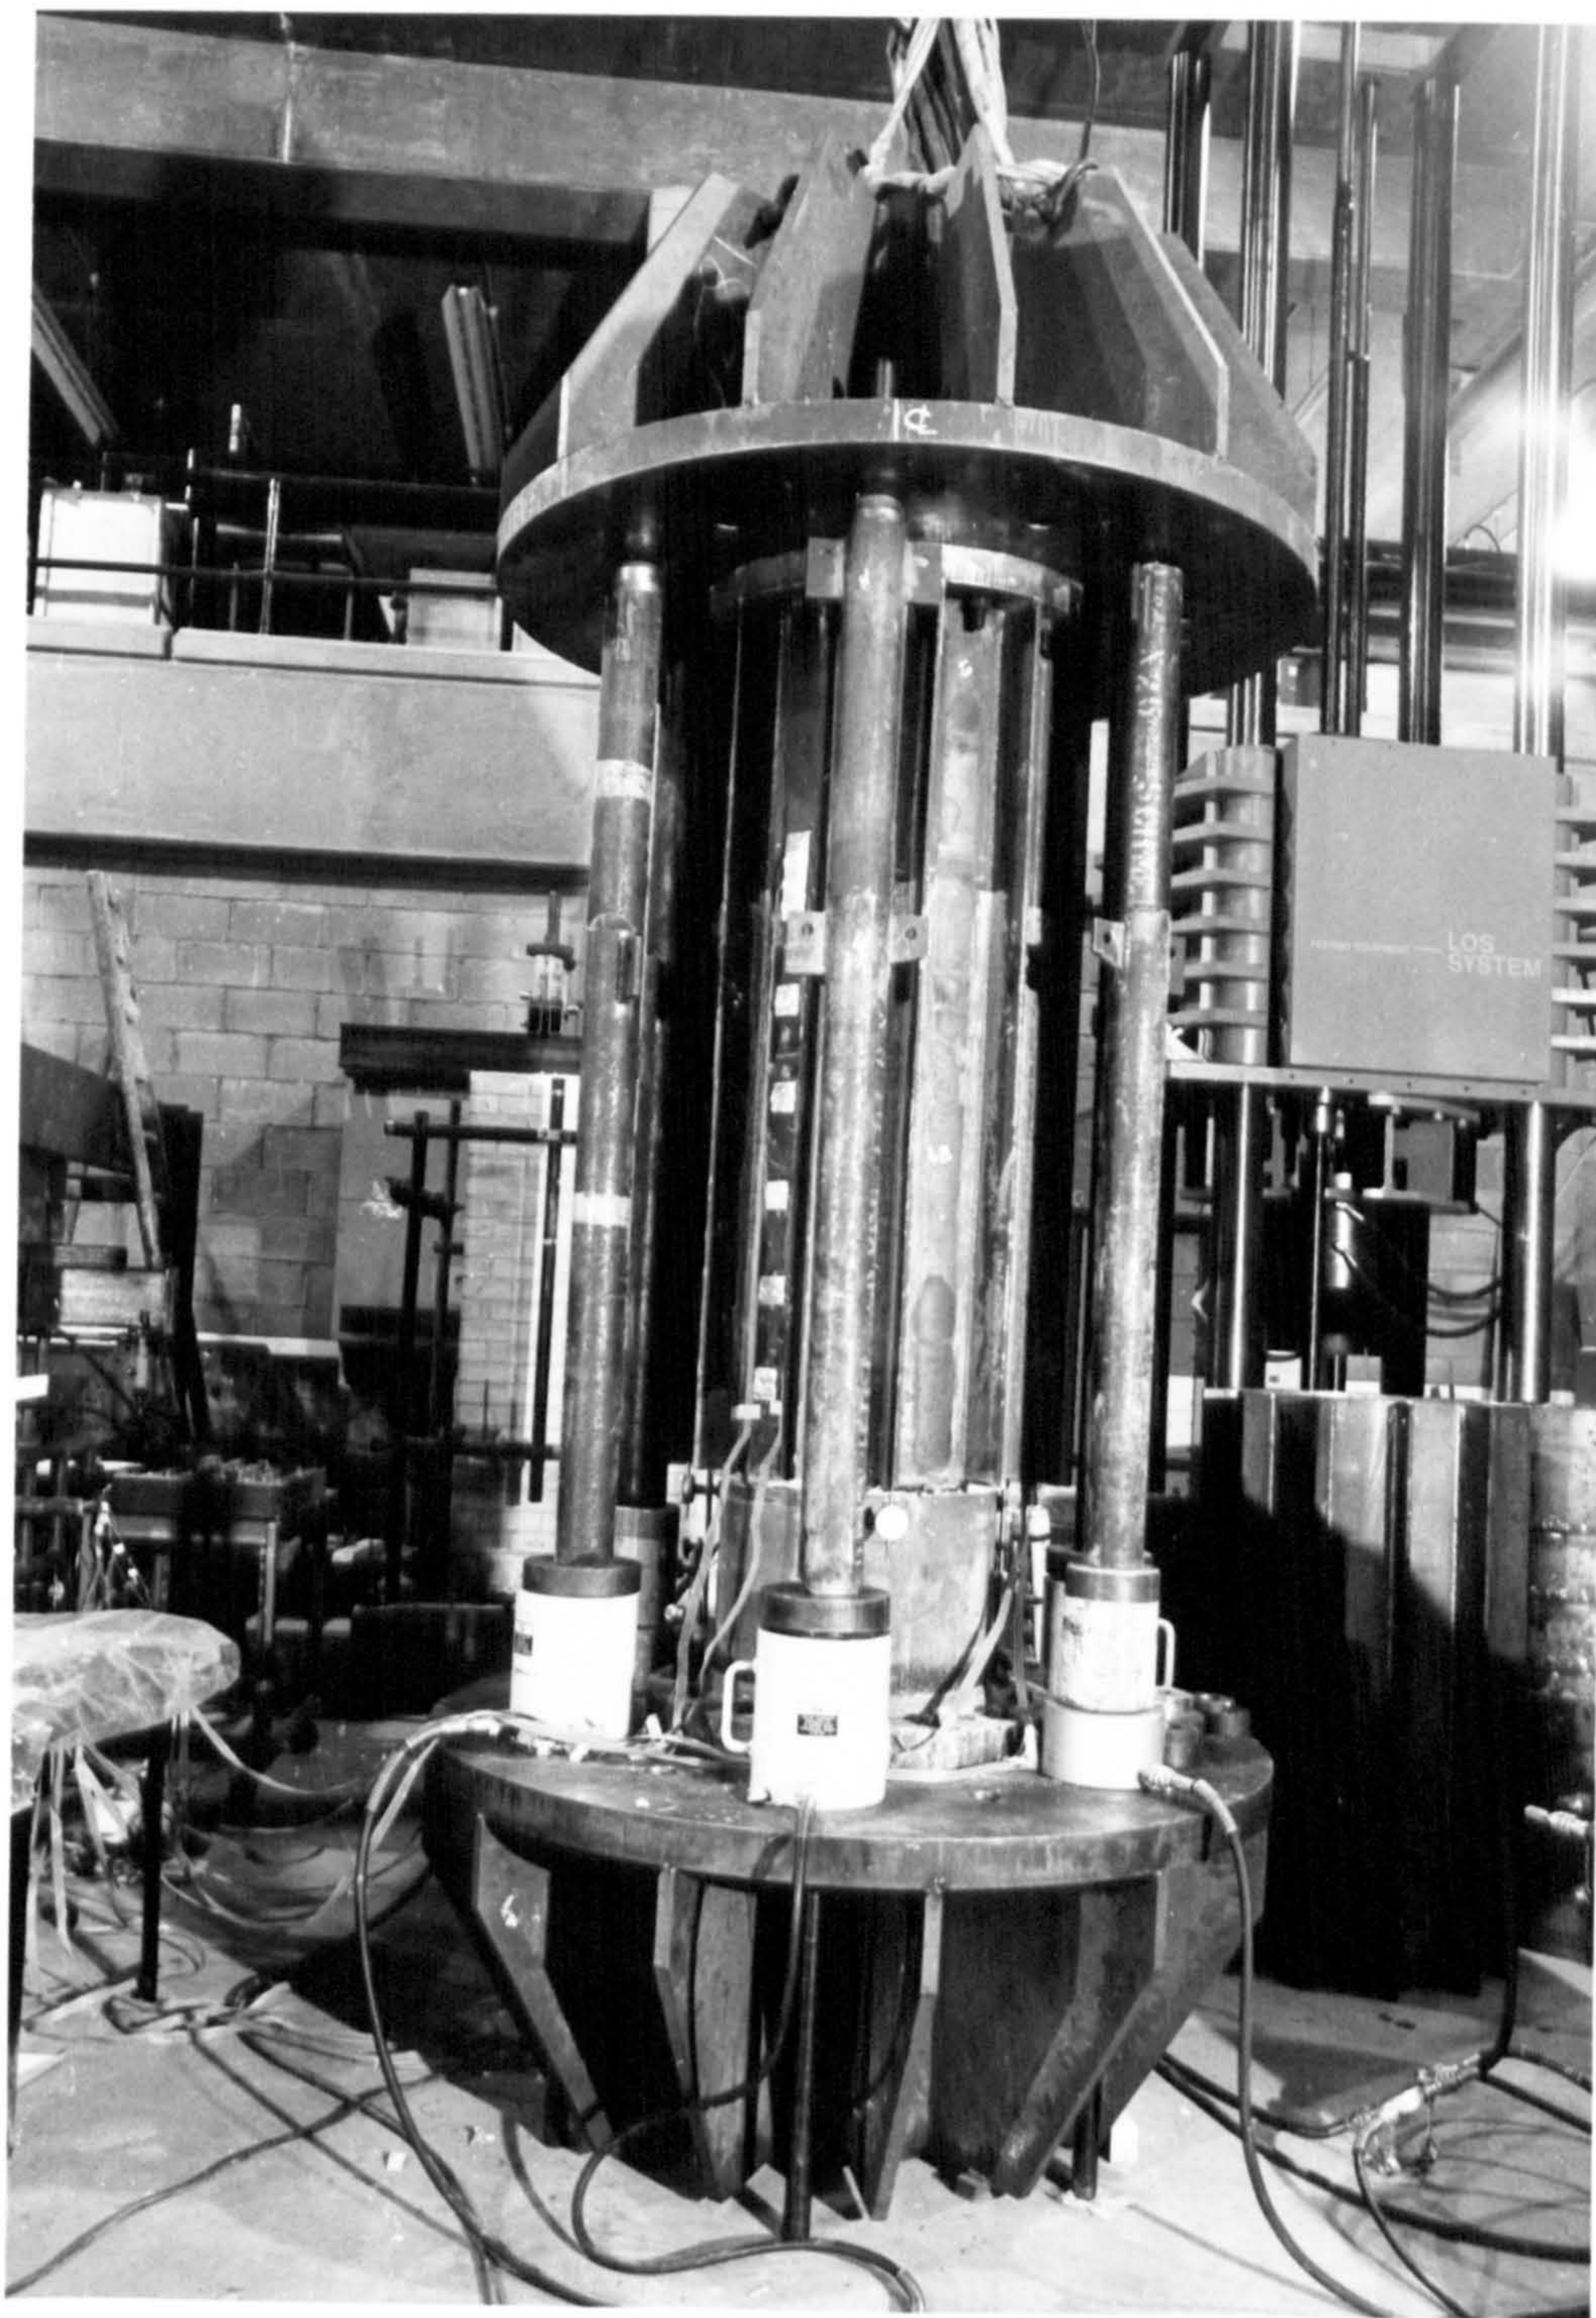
THE TEST RIG SET UP FOR TENSION LOADING. SIX JACKS ARE CONNECTED TO STRUTS WHICH FORCE APART THE STIFFENED END PLATES, ONE OF WHICH IS BOLTED TO THE PILE, AND THE OTHER TO THE SLEEVE.
